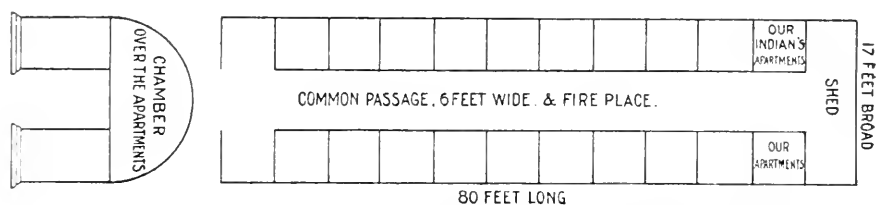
Bartram's ground-plan and cross-section of Onondaga Long House.
